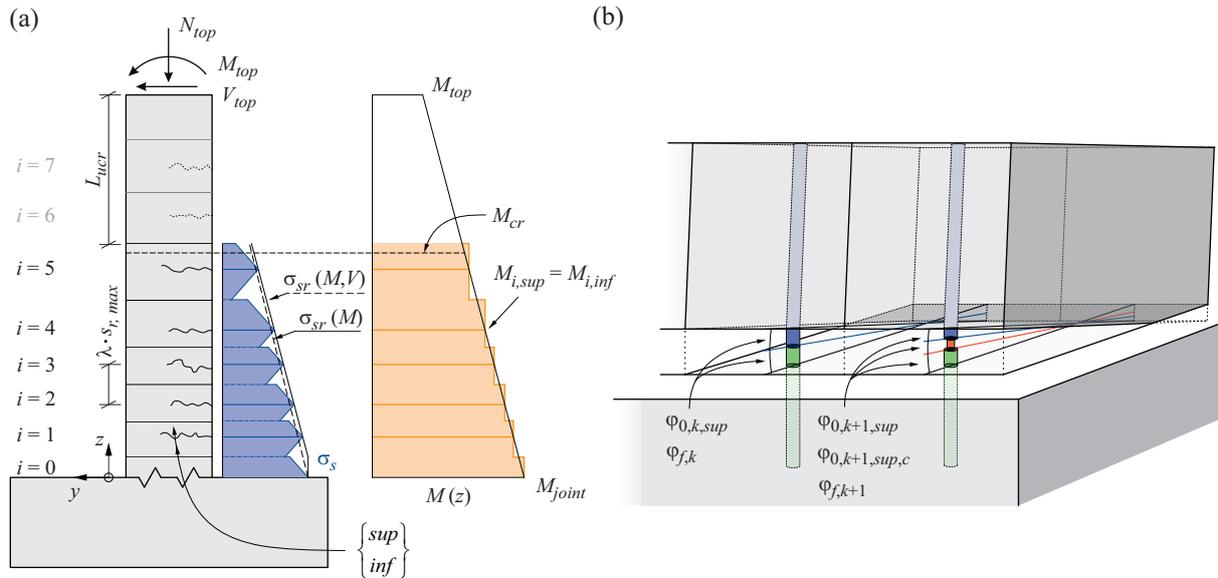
Dividing a retaining wall into several half crack elements: (a) definition of variables and loading of the wall as in the experiments (Chapter 6); (b) rotation compatibility of parallel flexural crack elements at construction joint.
